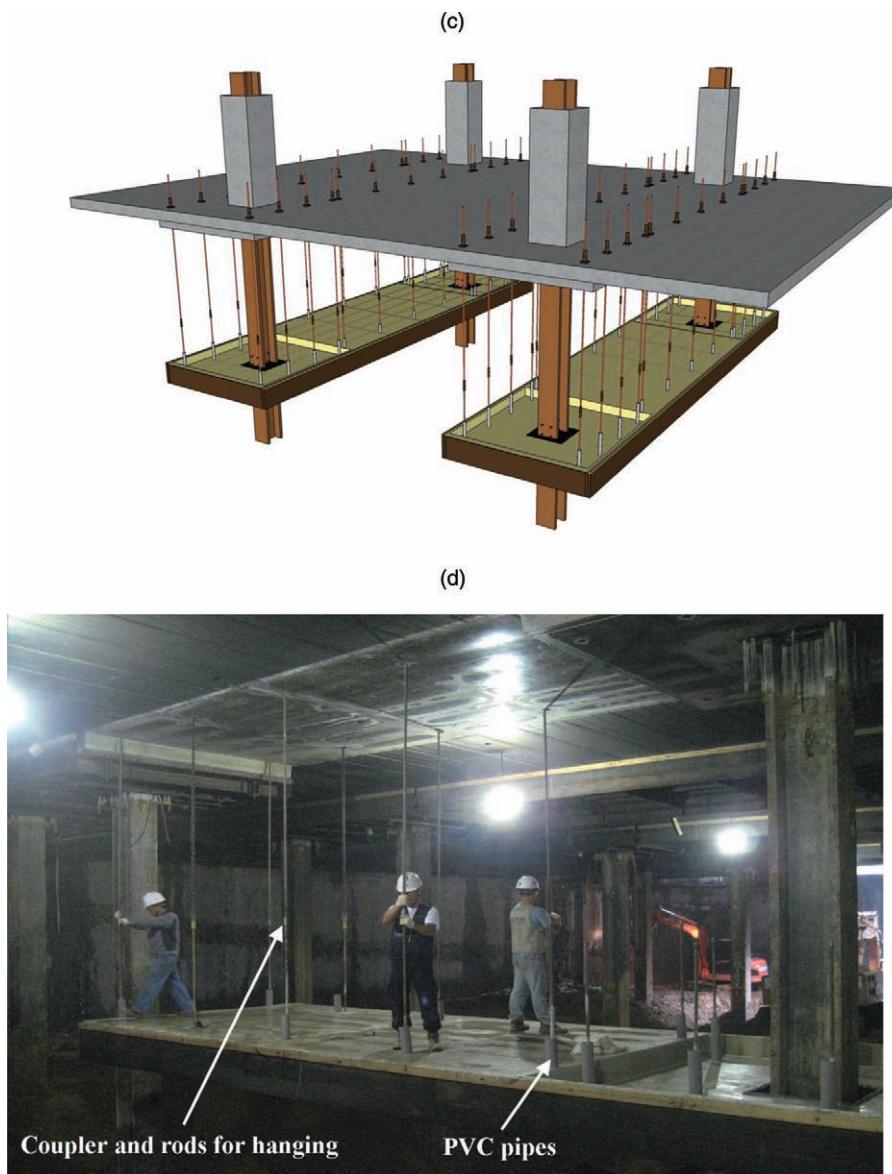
(c) Two flat modularized reinforced concrete system downward pour forms positioned. (d) Reconnection of rods
